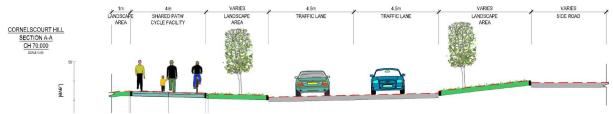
Cross Section for proposals on Cabinteely Greenway in Section A
